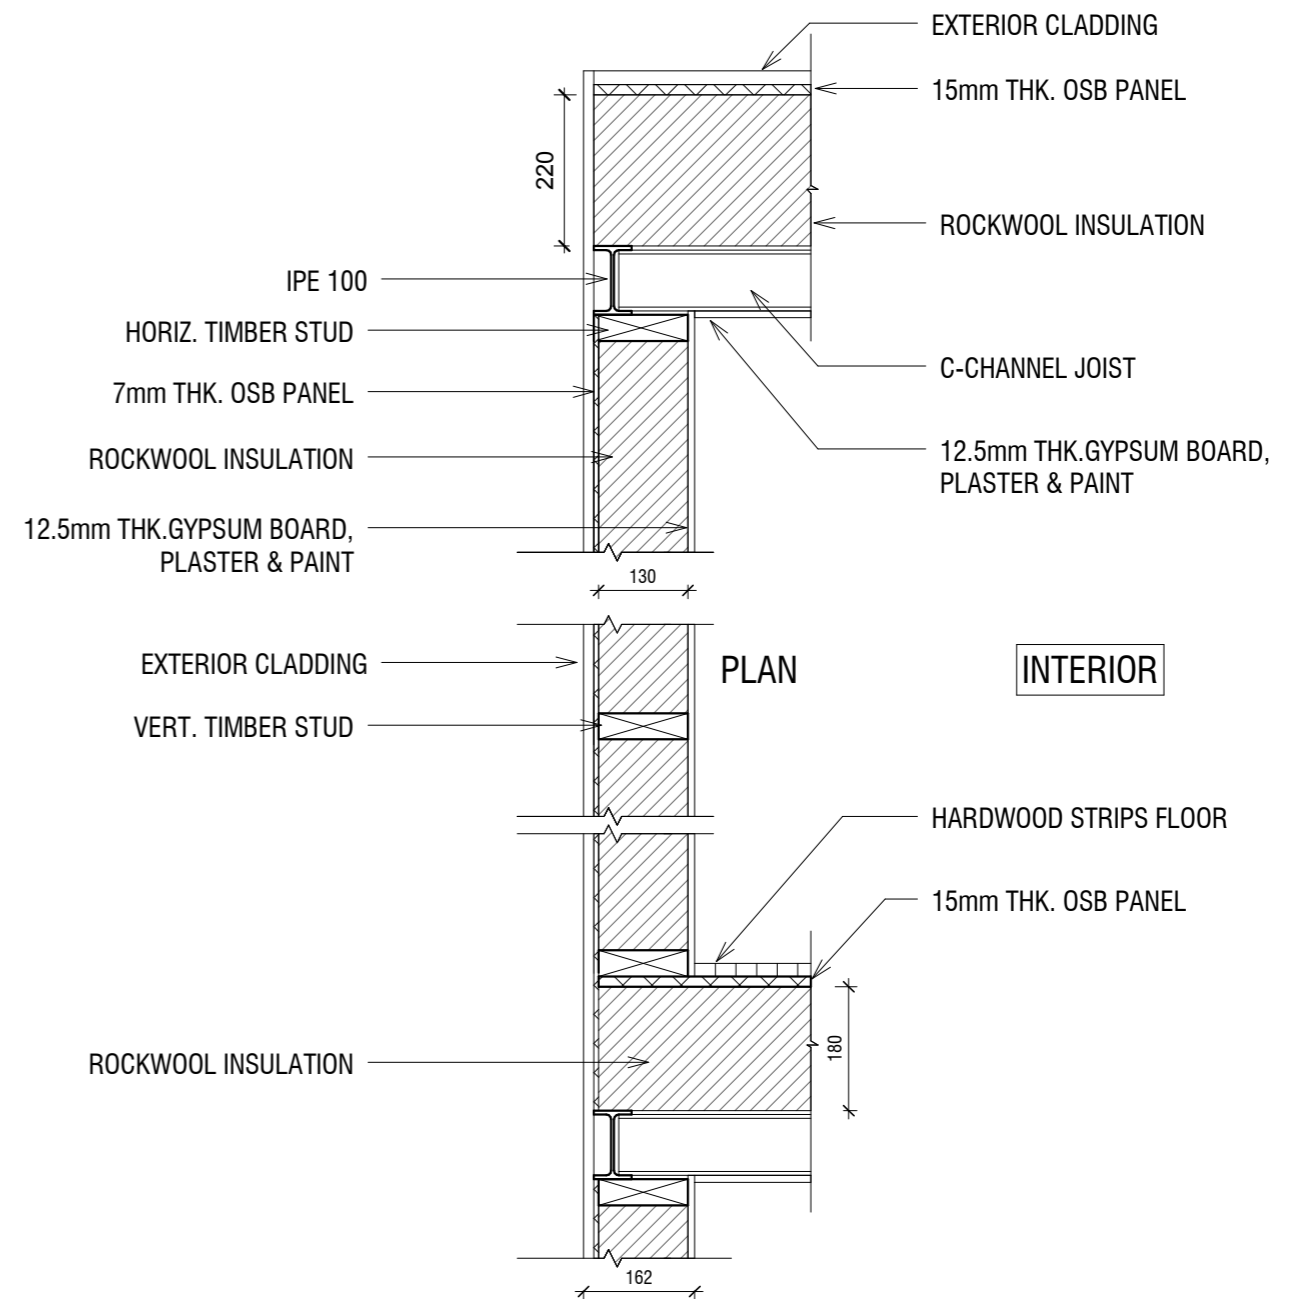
Steel structure assemblies. Vancouver 1:10
